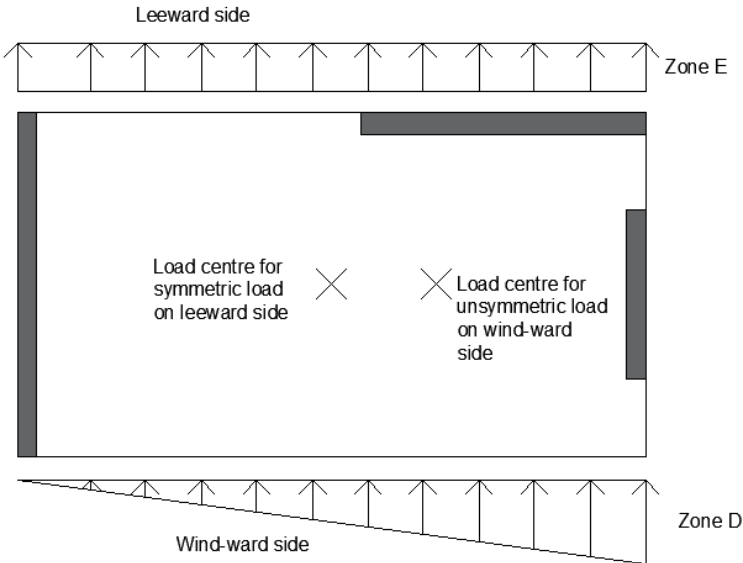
Asymmetric wind load on windward side and symmetric wind load on leeward side. Grey marked are shear walls.
